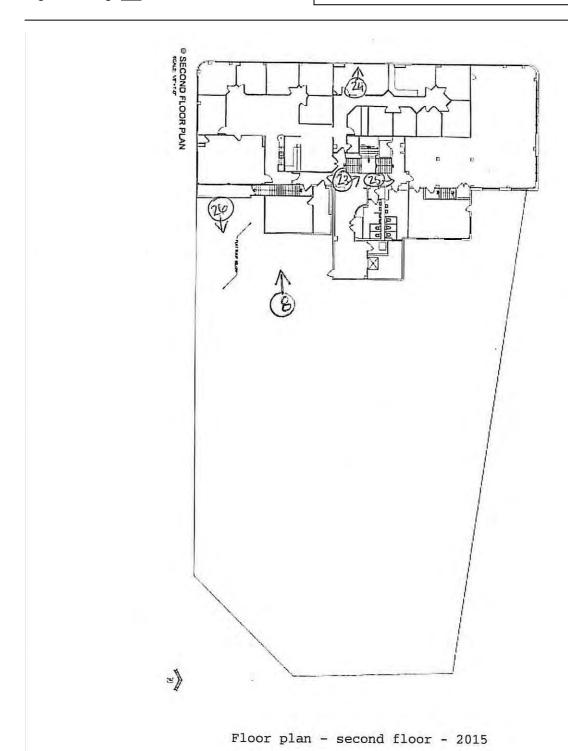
Floor plan provided by Rainieri Construction Company, St. Louis, MO.
